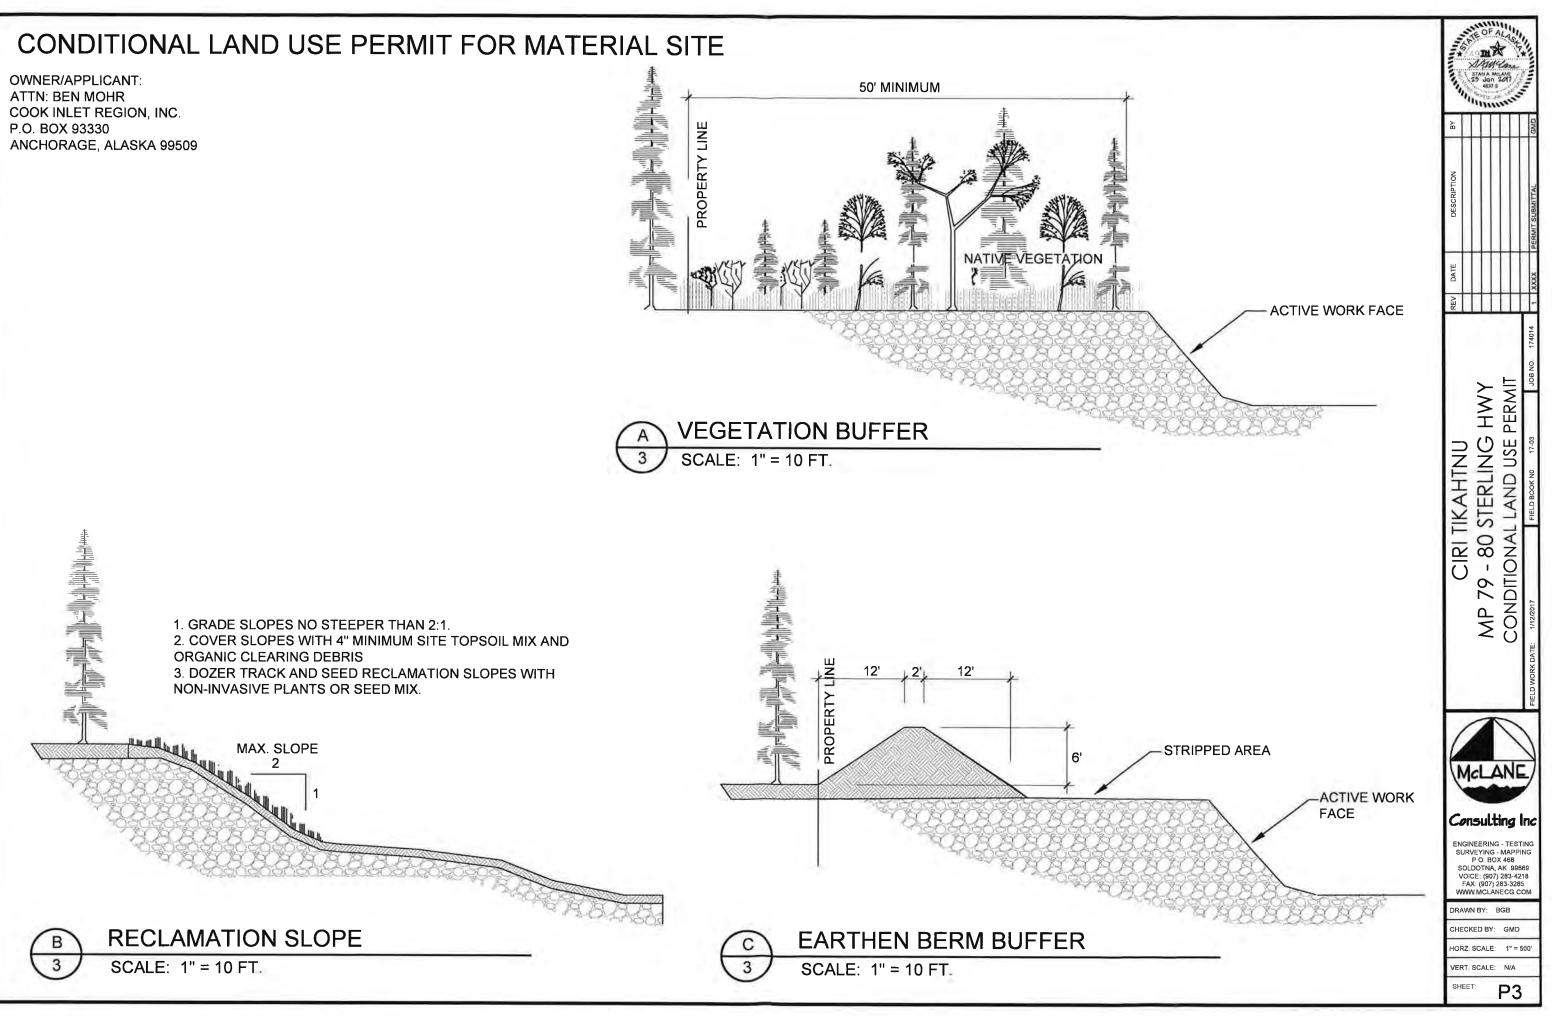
EXHIBIT A - SAND AND GRAVEL EXTRACTION CONTRACT STERLING GRAVEL PIT
